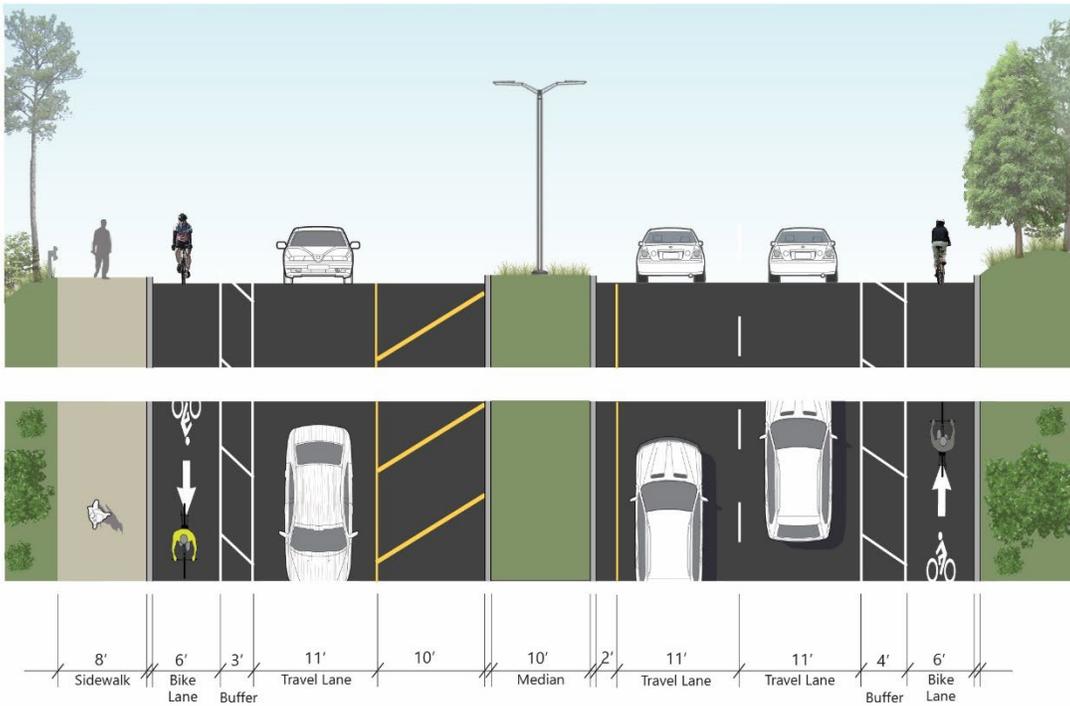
Section G-1: Existing Condition on Fellsway West (at I-93 off-ramp), facing north
